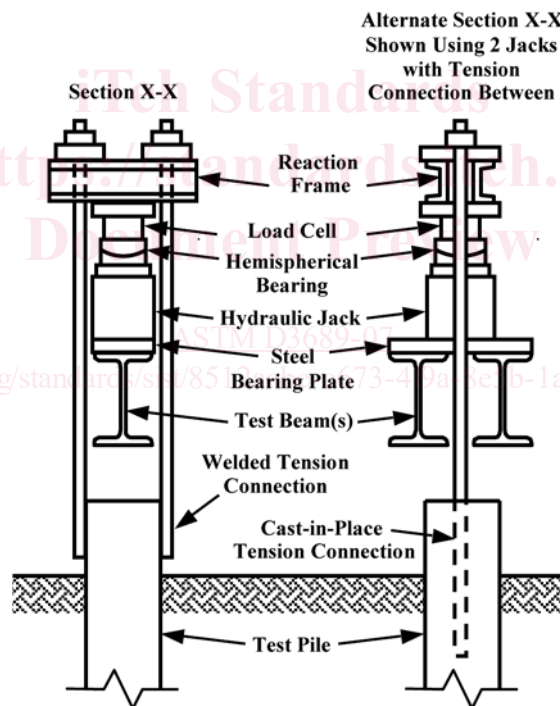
Typical Section X-X (Fig. 1) of Test Beam(s) at Test Pile
